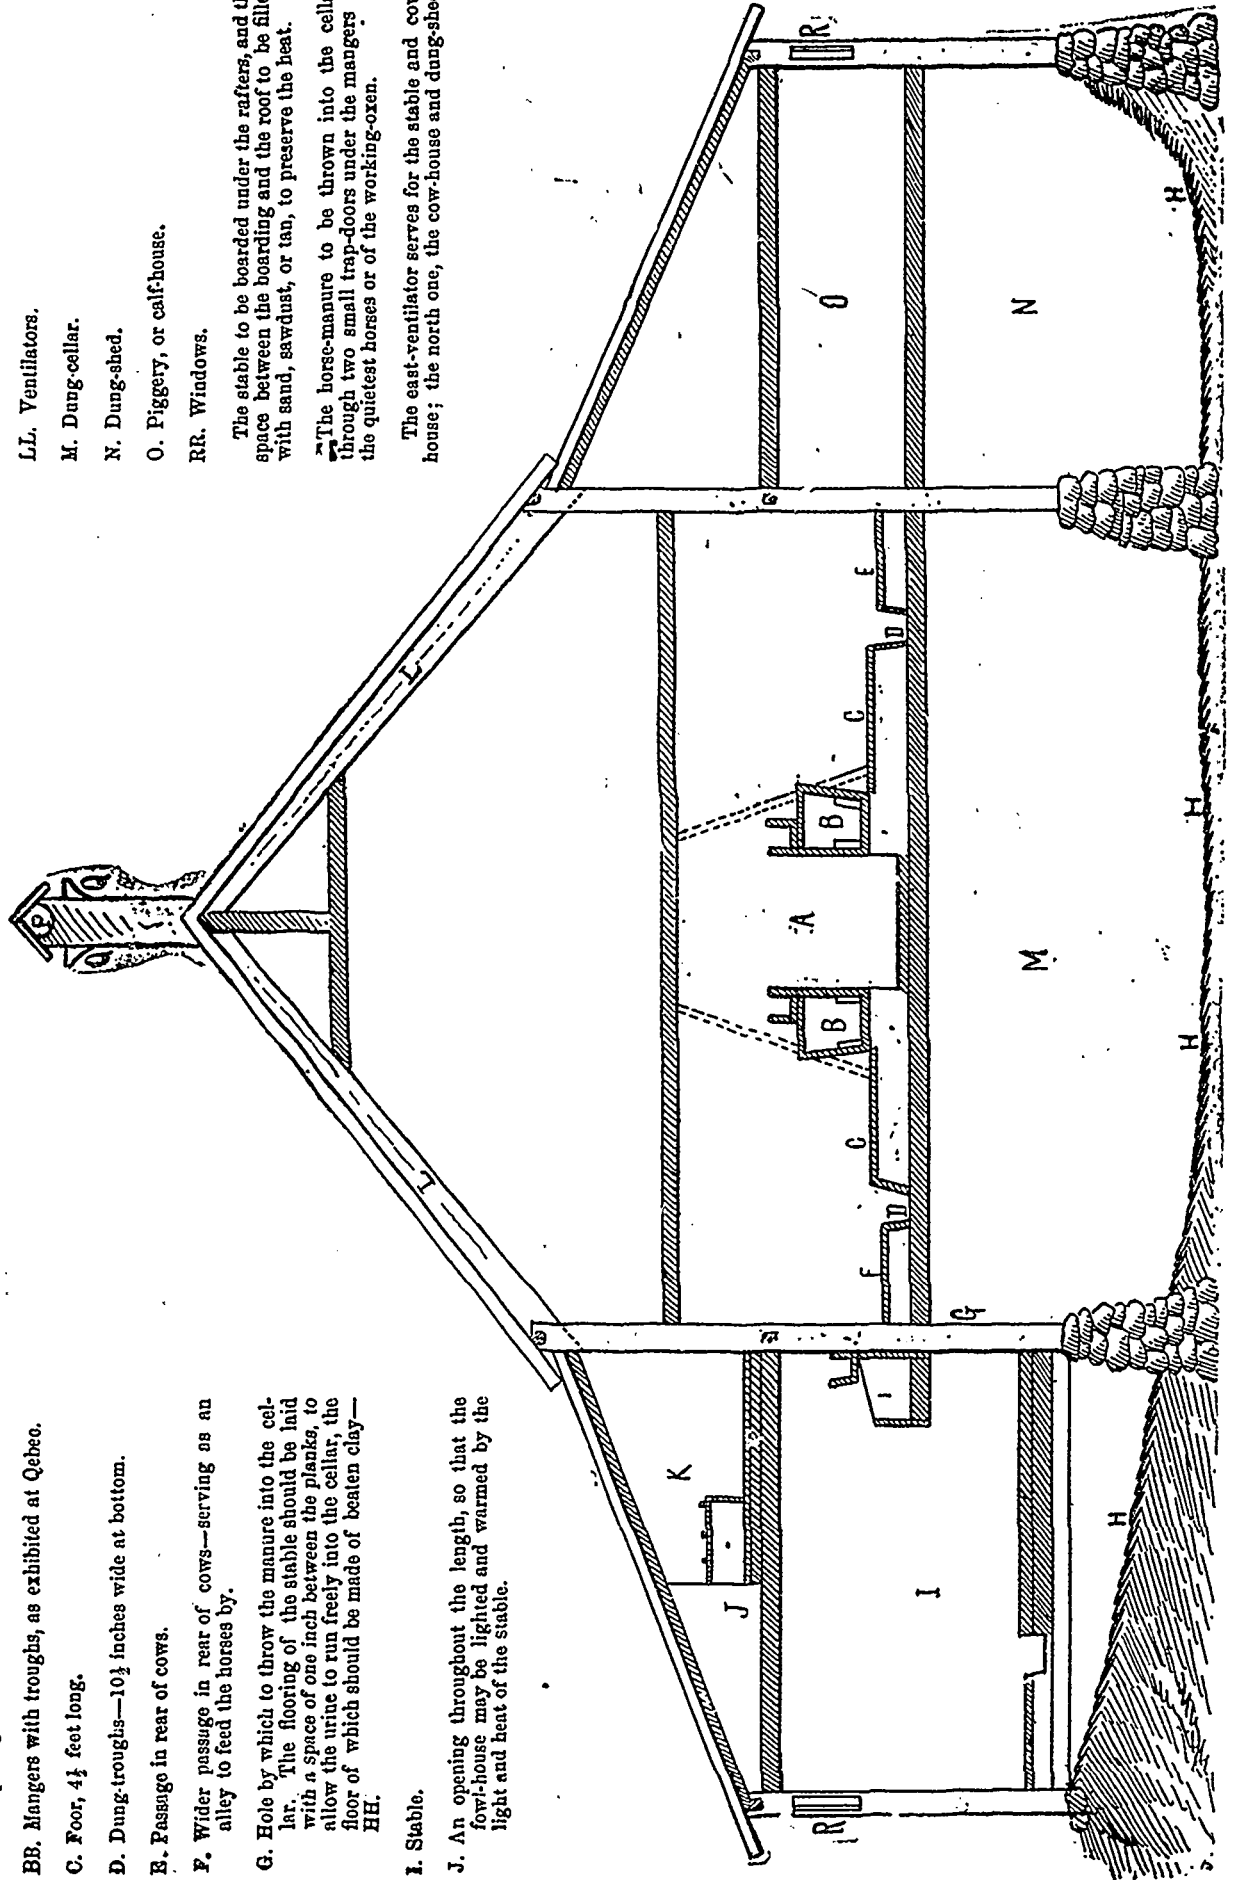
Section of the cowhouse raised 4 or 5 feet by lengthened and “entis” posts, with lean to the west for a stable and dungshed; to the north, pig-sty, &c., above the dungshed.
